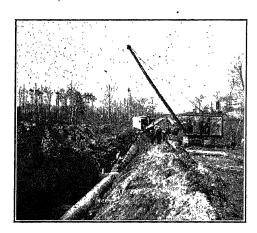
LAYING OF STEEL PIPE LINE FOR SPRINGFIELD, MASS., WATER SUPPLY. 30-FT. LONGITUDINAL JOINTS ARE AUTOMATICALLY ARC WELDED. CIRCUMFERENTIAL JOINTS MADE IN THE FIELD ARE RIVETED
